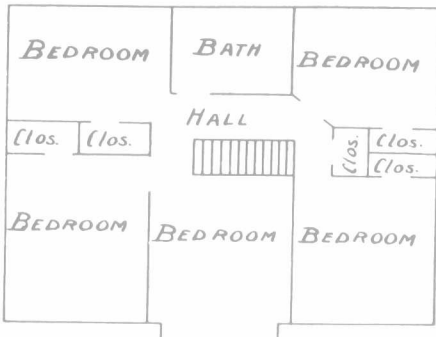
In above plan, long closet door should be more to the right to come within the bedroom. A slight mistake was made in the cut.
